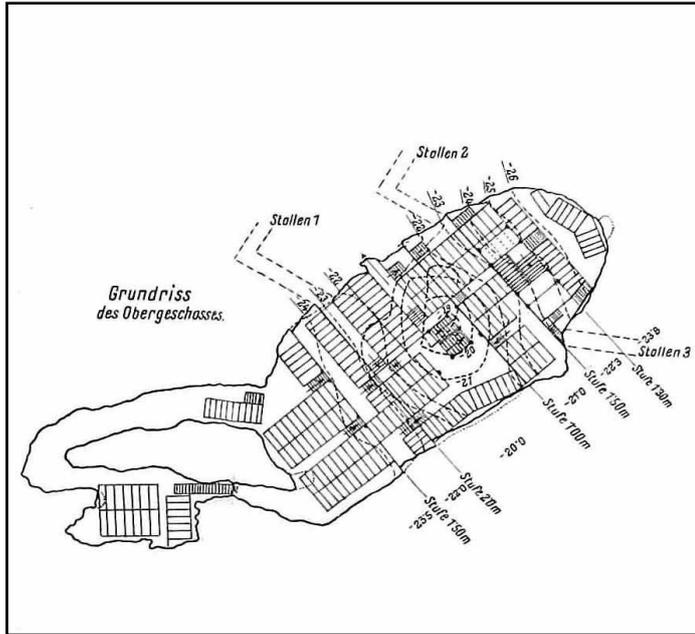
Plan and section of the cave Loishöhle published in *Der Kavernenbau (Teil 1b)*.
